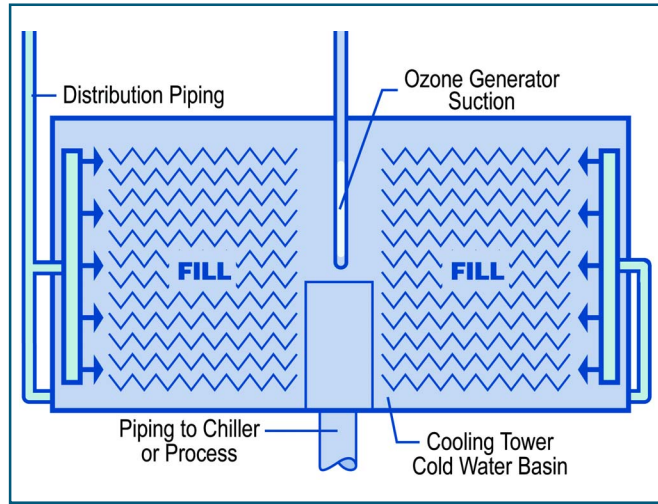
Ozone distribution/piping layout for a typical cross-flow cooling tower cold water basin.
